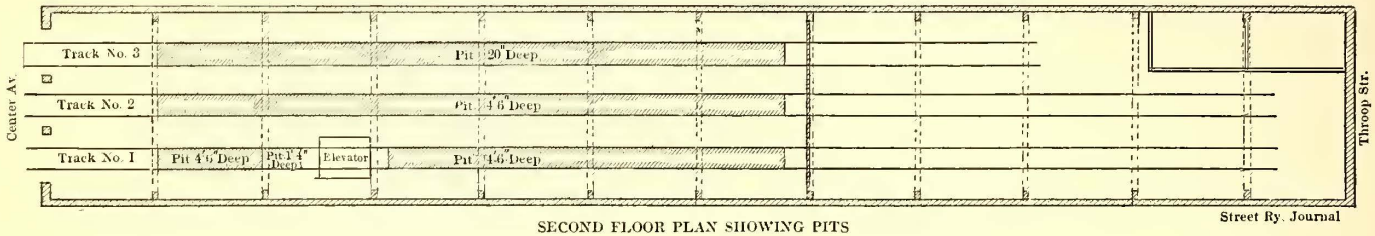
PLAN OF SECOND FLOOR OF THROOP STREET REPAIR SHOP
